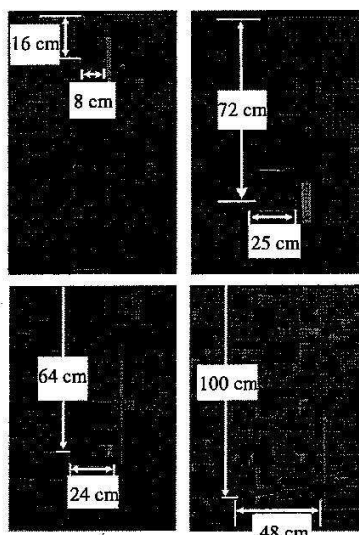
Examples of physical models showing roof failure after opening widths exceed their maximum unsupported spans. Top: openings in rock mass model formed by 4x4 blocks. Bottom: openings in rock mass model formed by 4x12 blocks.
